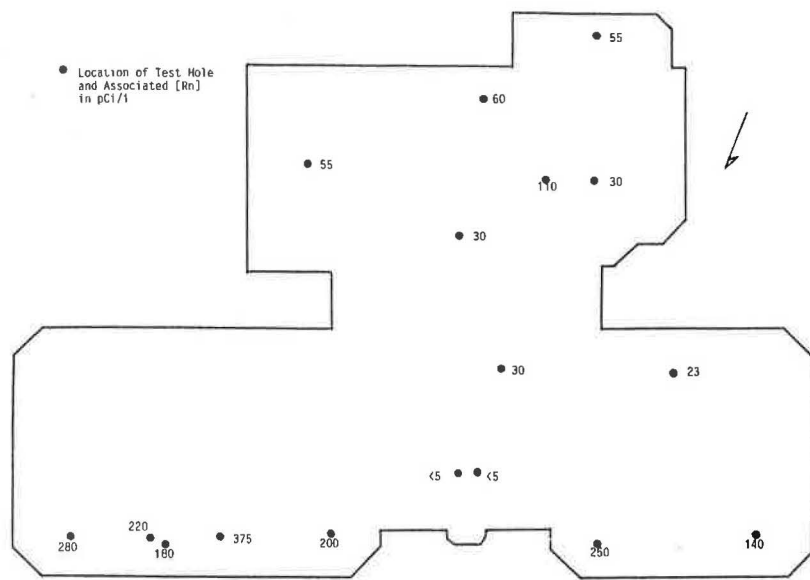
Subslab radon measurements; slabs in place approximately 4 months; most walls and some roofing complete (December 1987)
